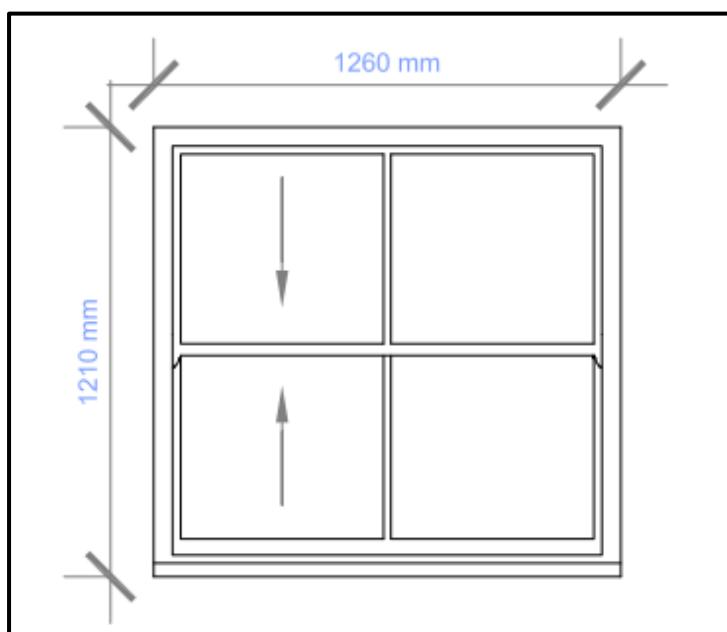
Proposed Rehau Heritage Sliding Sash Window Elevation
